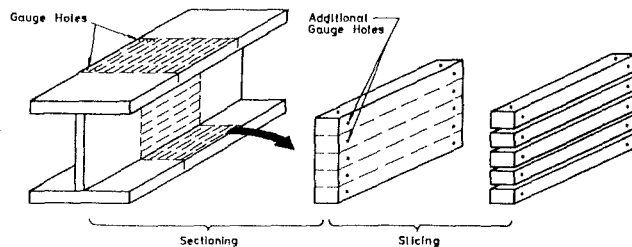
Sectioning of welded joist by Tebedge.
